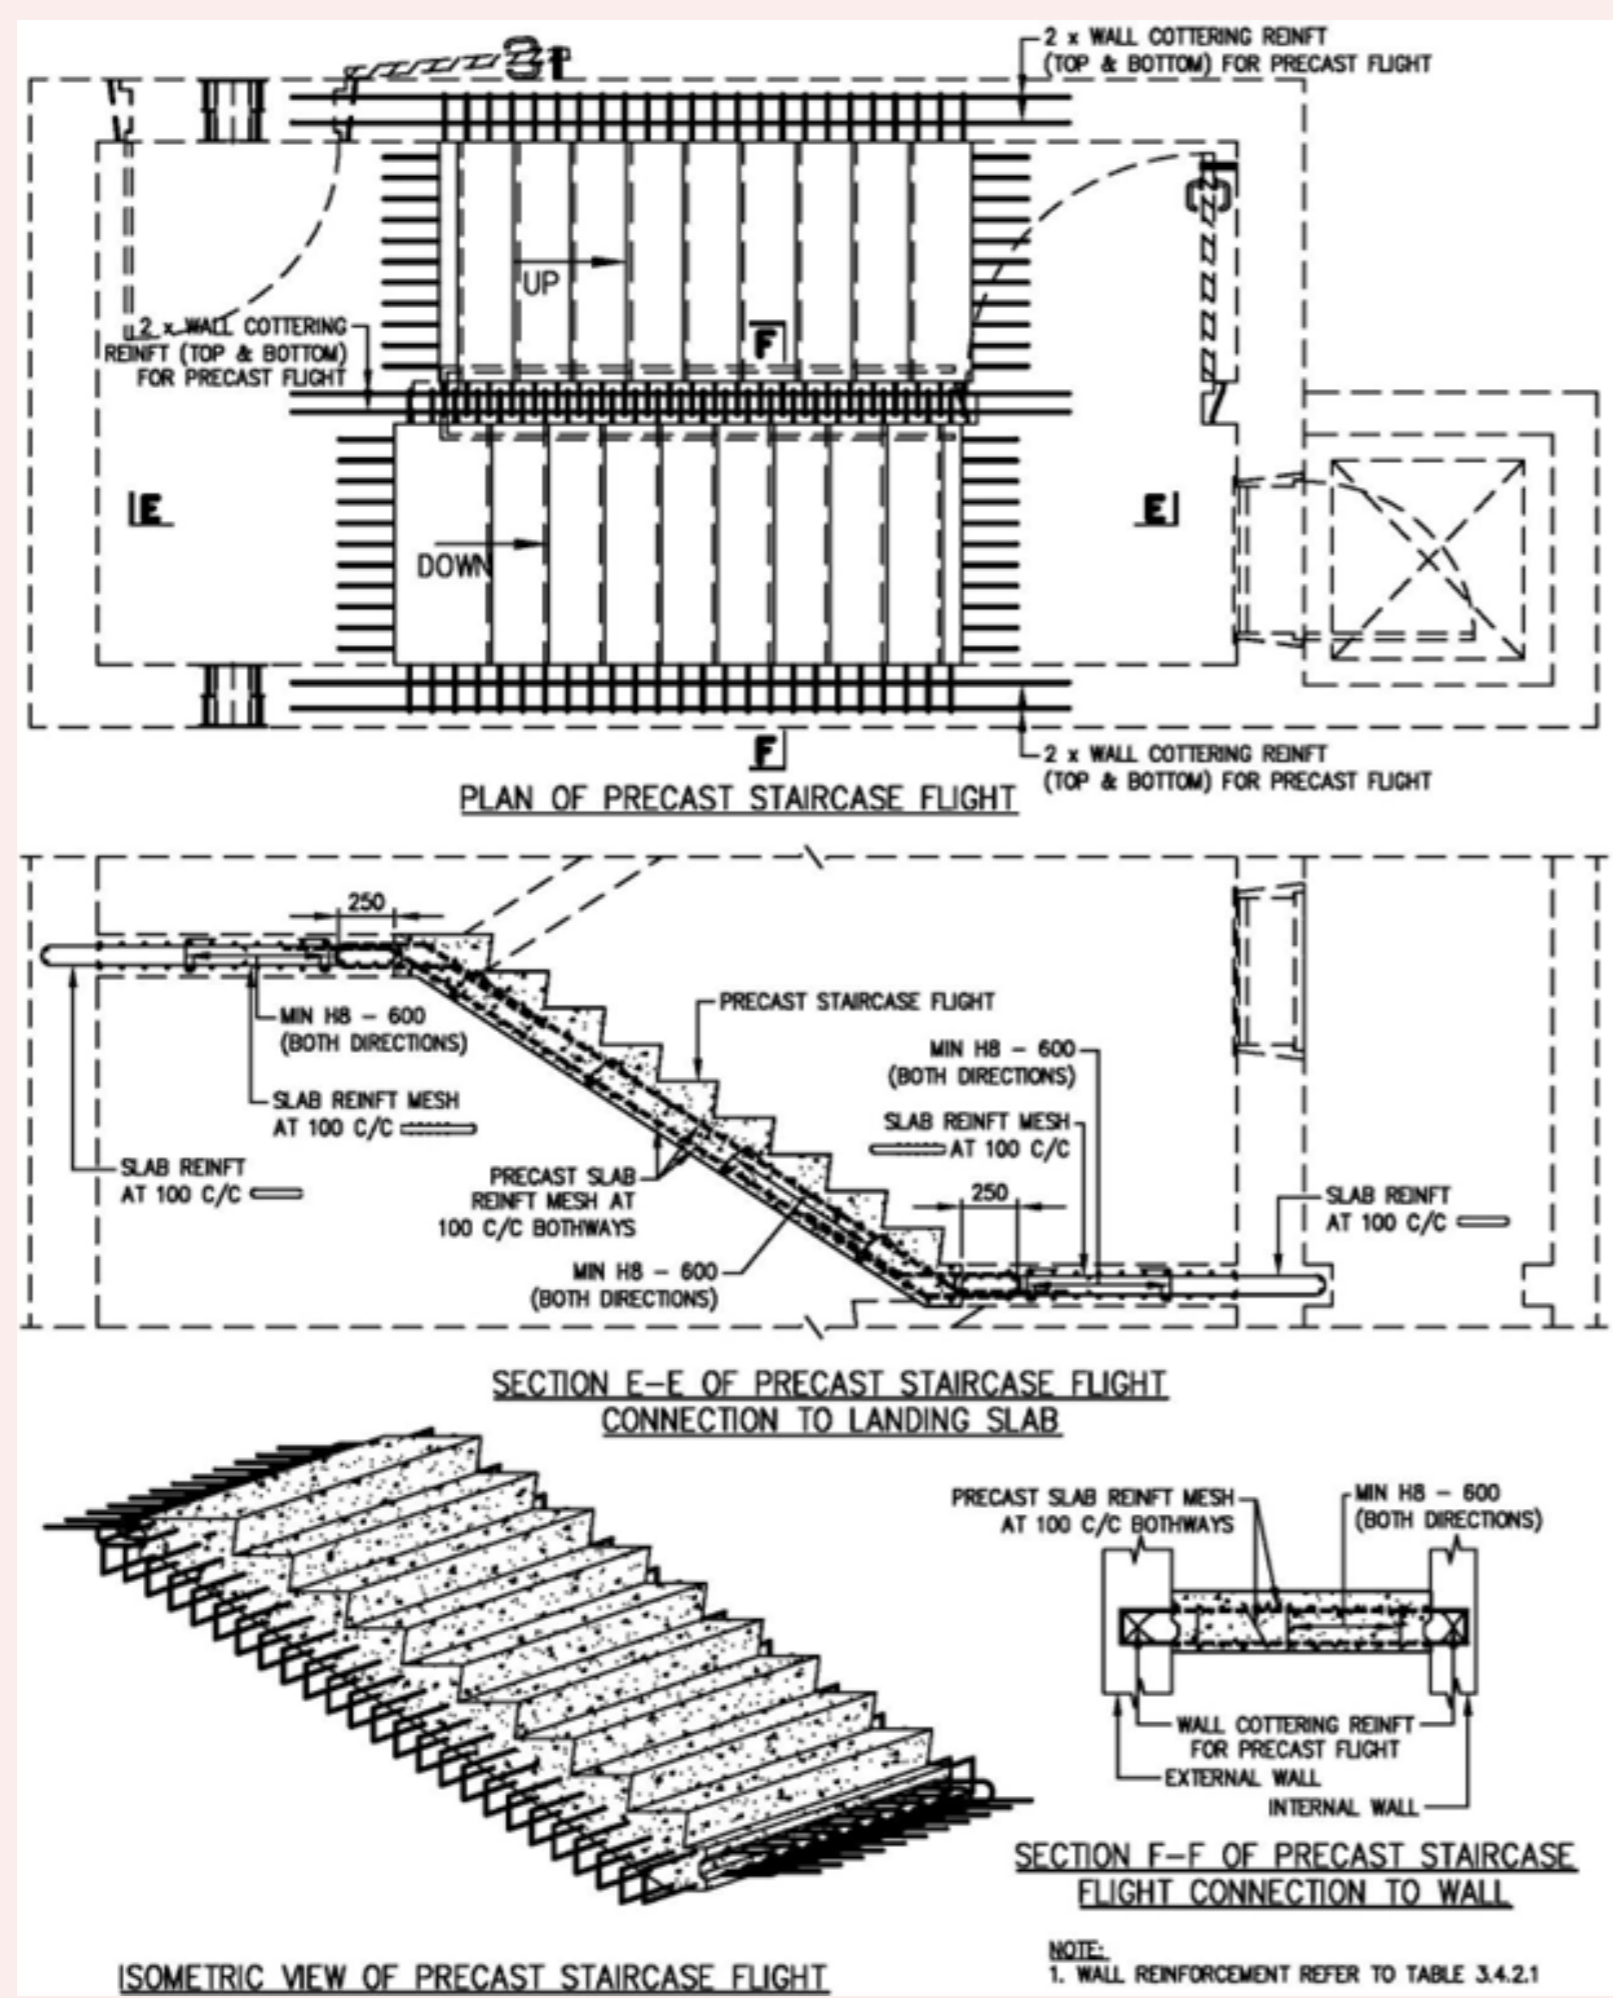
(p): PLANS AND DETAILS OF SS SLABS FOR S/C SS PRECAST FLIGHT
